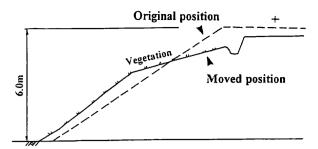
Typical damaged embankment; embankment of freight branch along JR Tokaido Line between Higashi-Nada and Kobekou (Site EM1 in Fig. 2)
